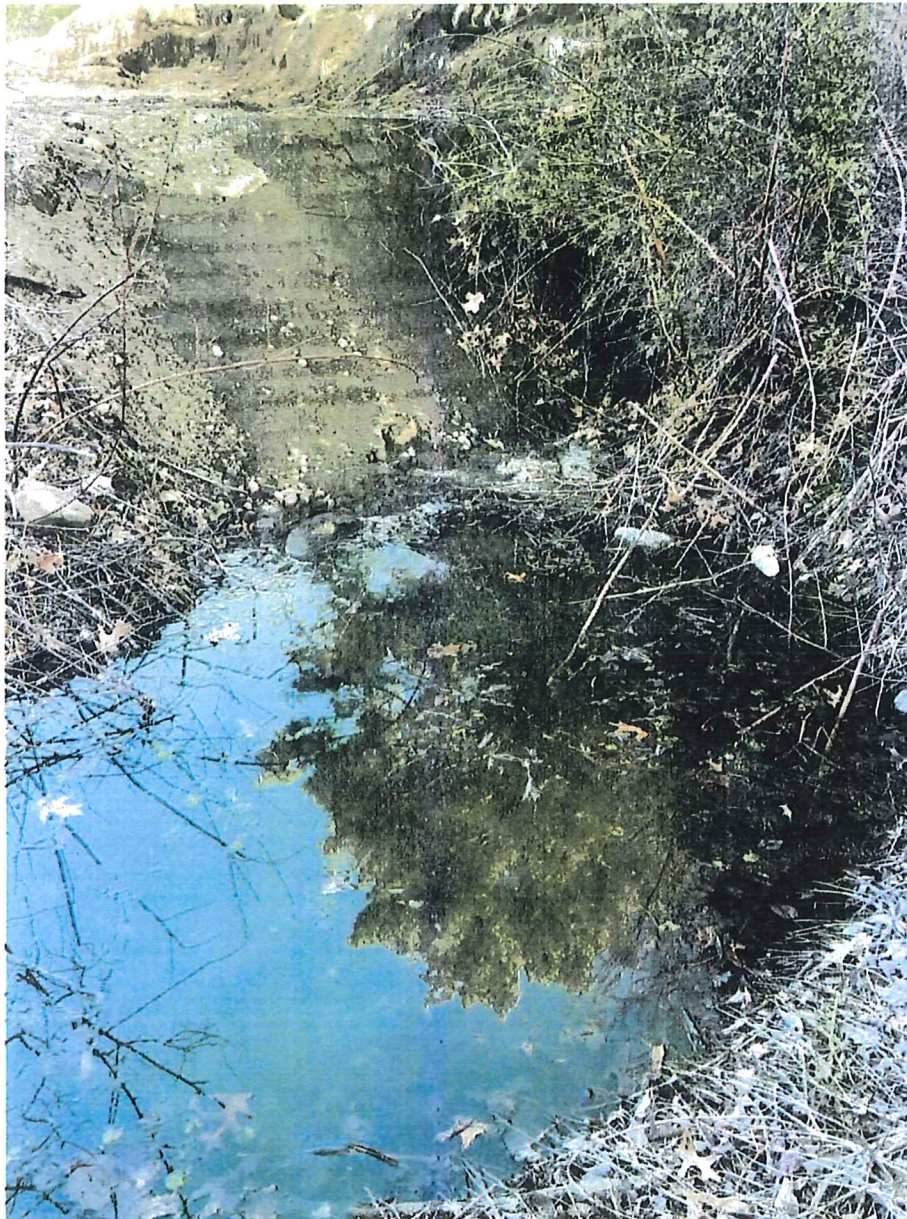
View of Excavated area on 217 Cocasset taken 4-8-2021 showing removal of 4-inch PVC pipe by owner of 227 Cocasset Street.
